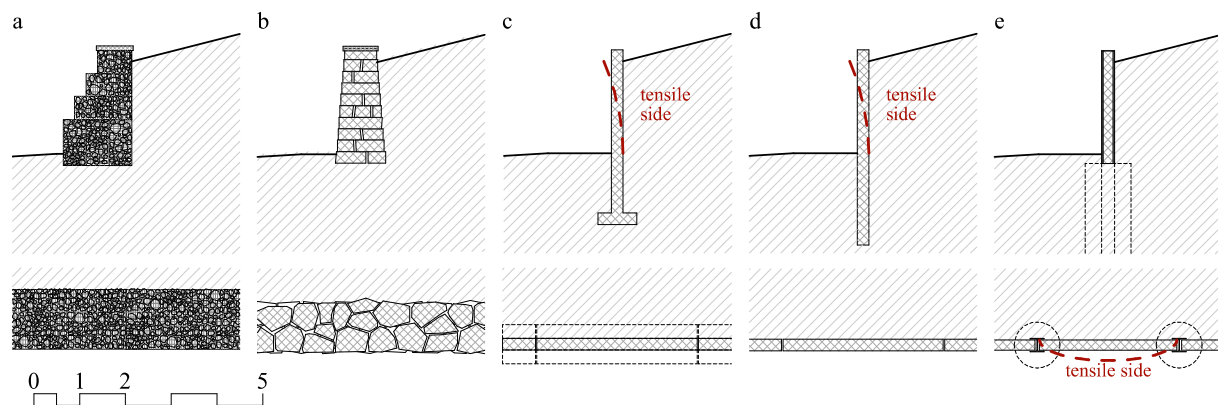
Preliminary design propositions, a) gravity wall with medium size blocks b) gravity wall with gabion basket c) cantilever wall d) piled wall e) soldier pile wall (red: deformation)
